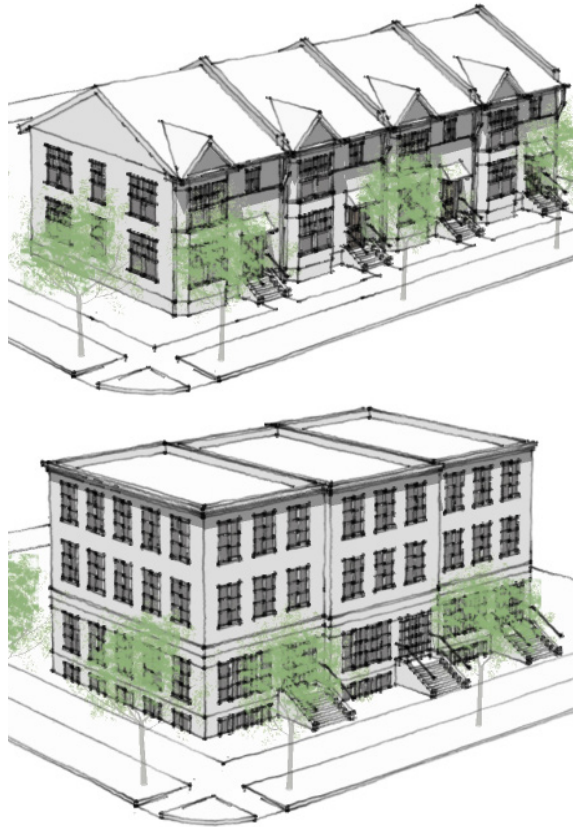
Row building examples. Pitched roof stoop entrance example (top) and parapet roof stoop entrance with visible basement (bottom)
